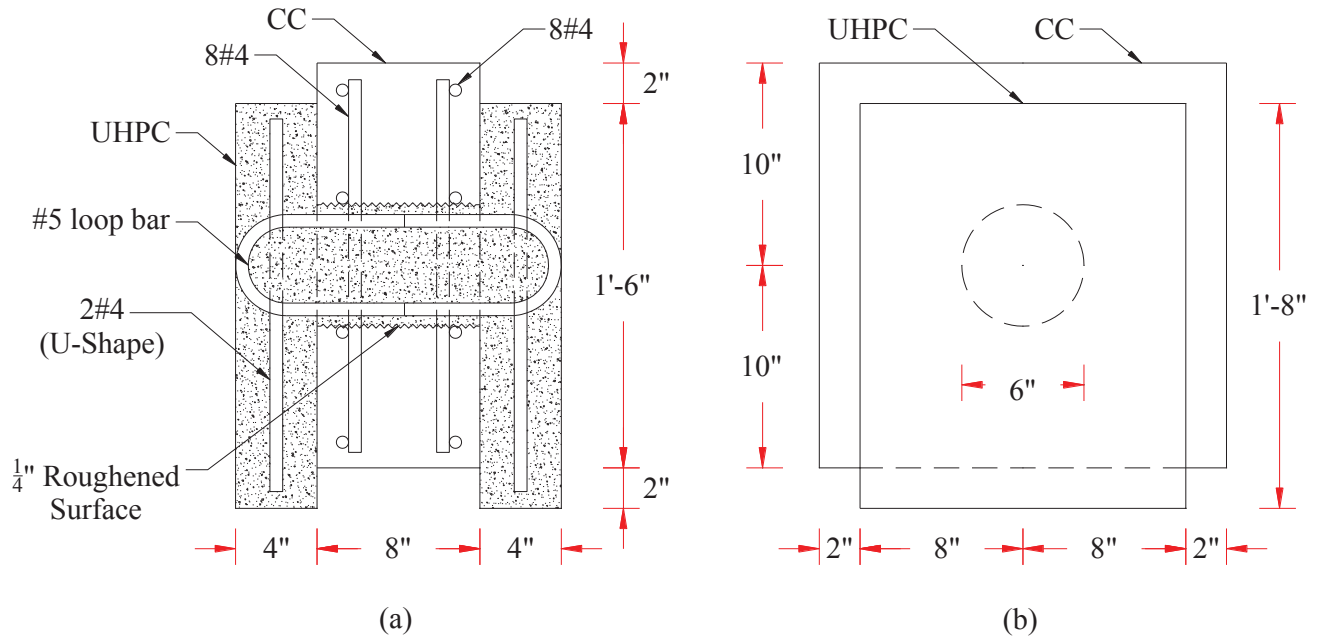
Double Shear Test Specimen Details; (a) Section Elevation, and (b) Side View.
